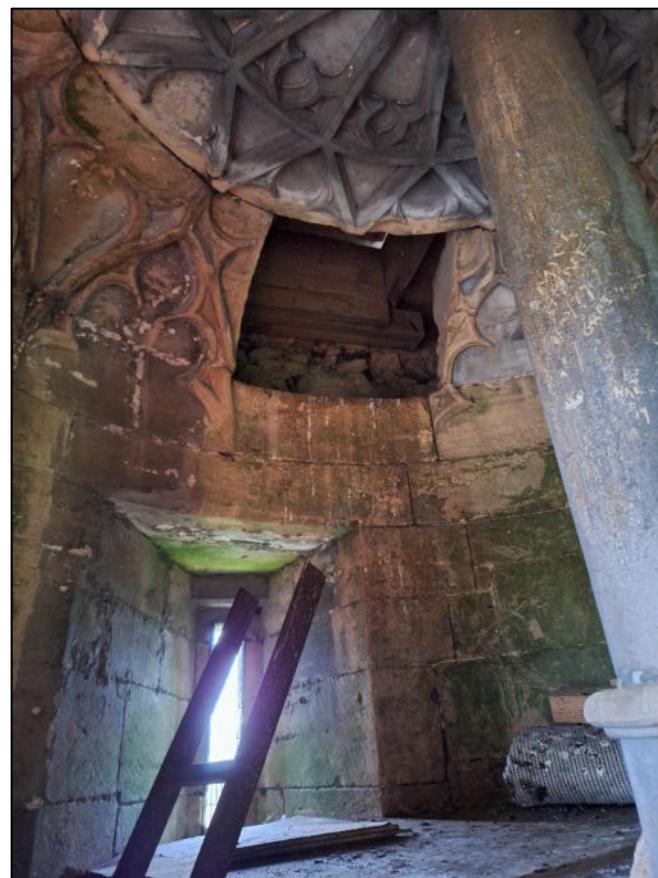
Internal decoration of Kyme Tower ceiling, with gap in decorative cornice of vaulted ceiling.
